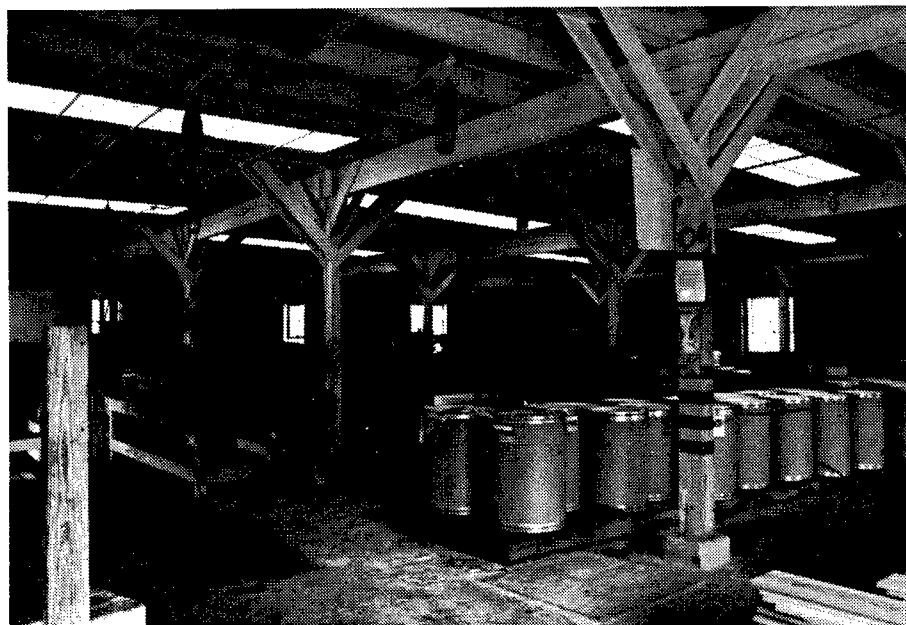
Building Y1: Box Construction and Reconditioning Building.
